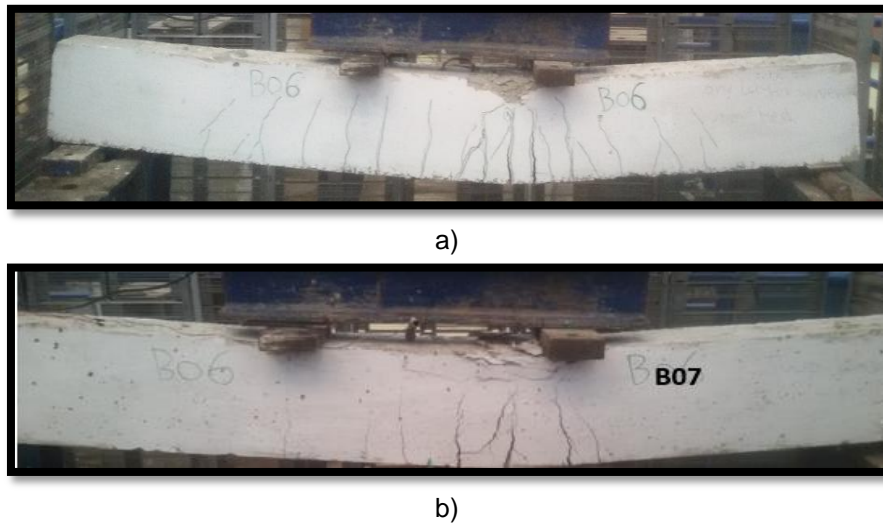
Crack Pattern of Group C, a) Beam B06; b) Beam B07
